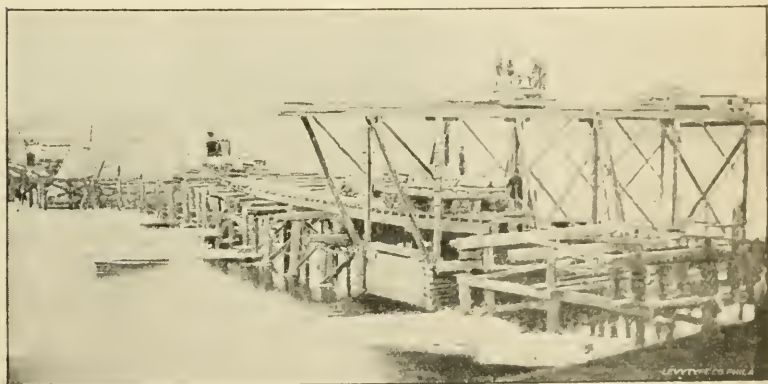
CAISSON FOR PIER NO. 6, DECEMBER, 1867.
